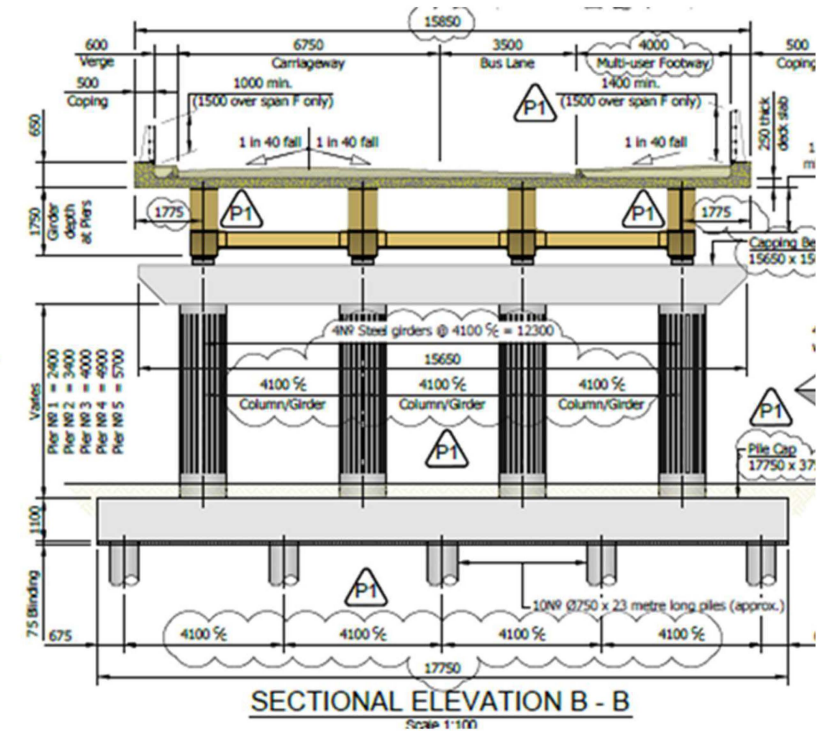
Section through viaduct showing pier arrangement and bridge deck form
